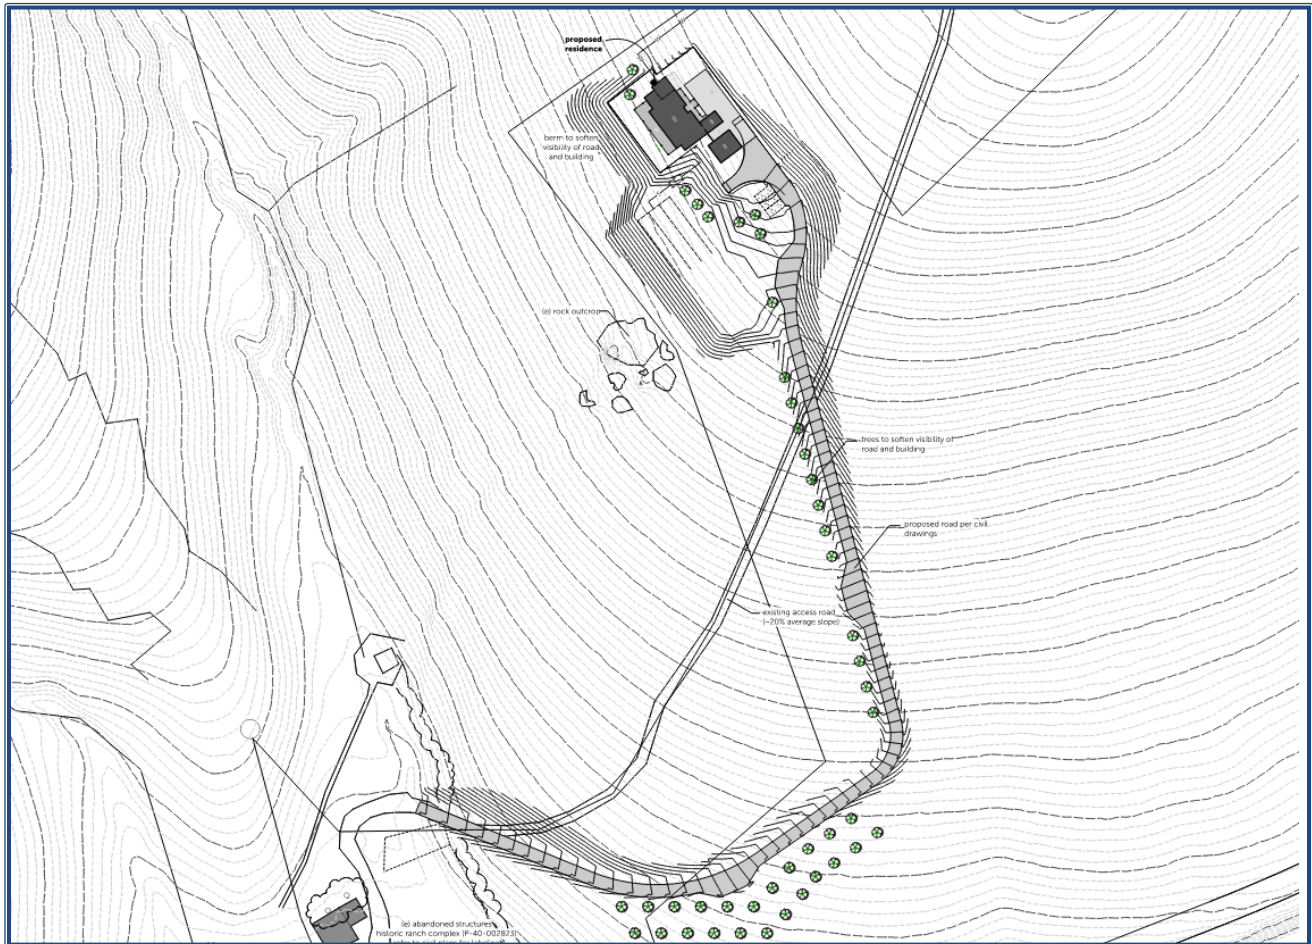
Enlarged Architectural Site Plan (Jade Architecture, October 17, 2024)
